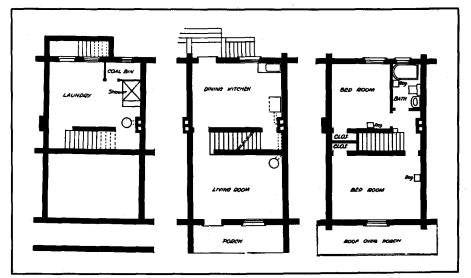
Basement, first and second floor plans for typical 16-ft (5 m) frontage house.
